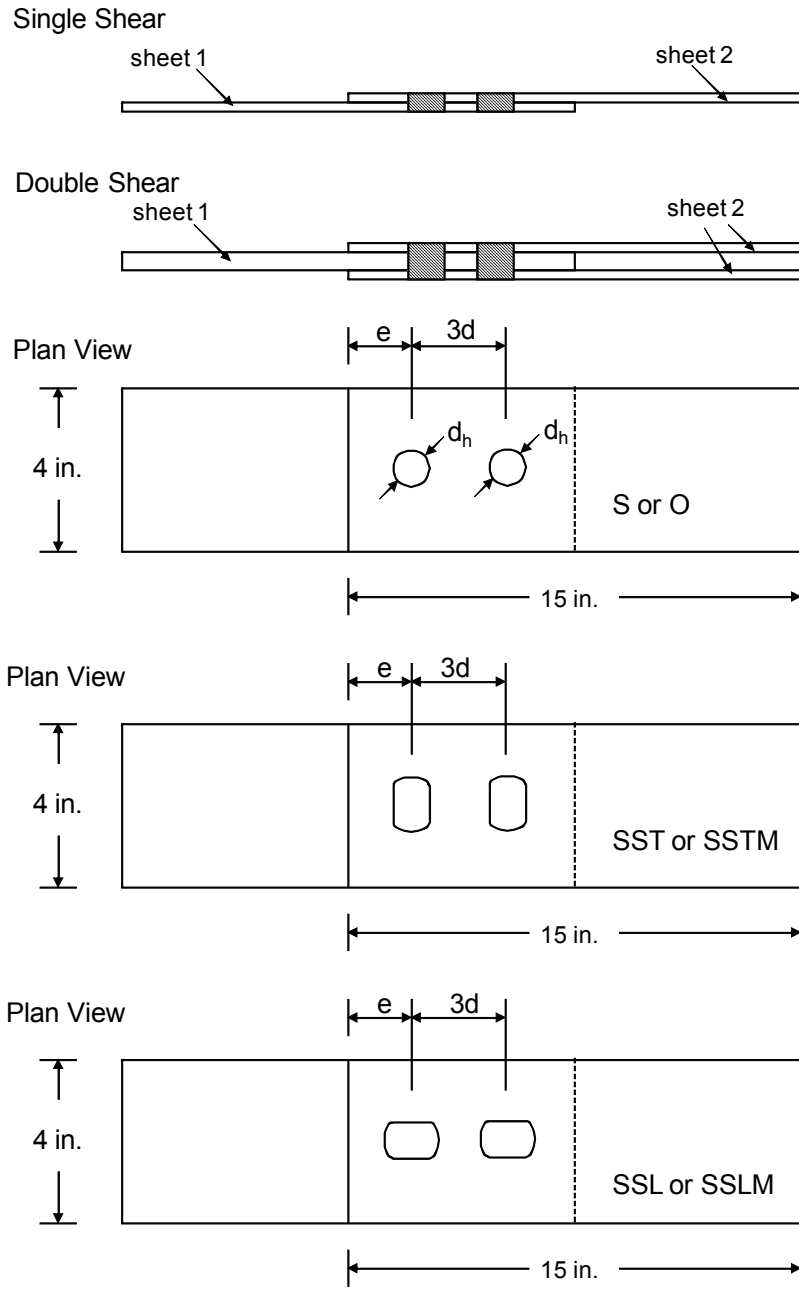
Dimensions of Specimens with Two Bolts for Bearing and Shear Failure
